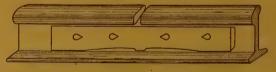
Sketch showing how similar wear on a 4-bolt flat plate could be rectified by reversing the plate.
